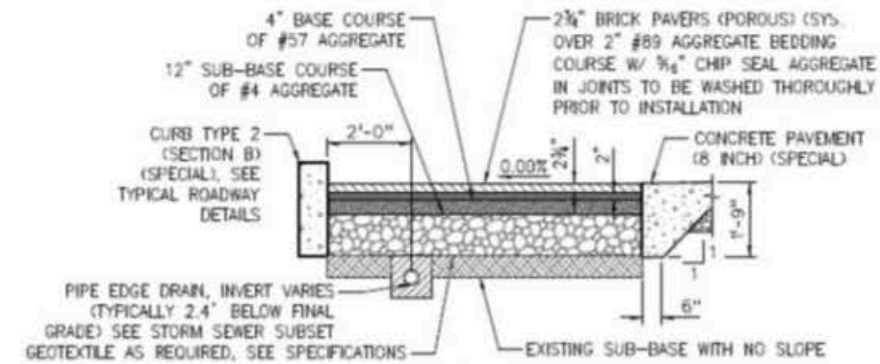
Pearl Pkwy Permeable Pavement Cross Section
